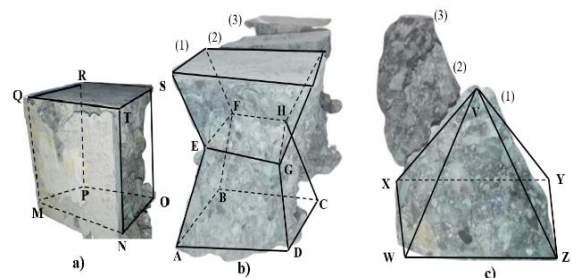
a) fracture surface of a rejected case in the GS30 samples, b) fracture surfaces in the GS20 samples, and c) fracture surfaces in the GS10 samples.
